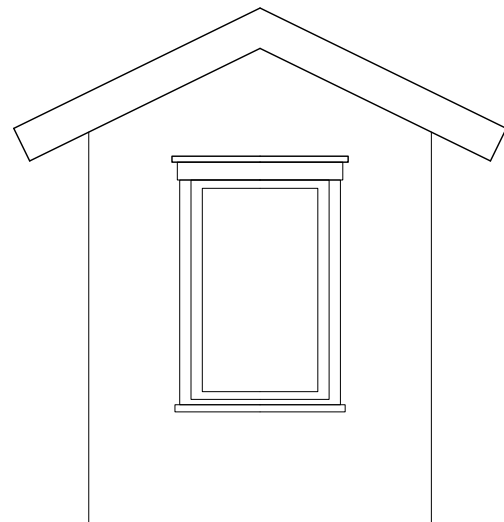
This image shows how building side walls should be treated depending on lot conditions. Buildings that have side walls that are adjacent to publicly accessible space should add detail, glazing or entrances to the side wall to avoid large blank surfaces. Buildings that are adjacent to buildable lots with no side setback may have blank walls in anticipation of future site development.
